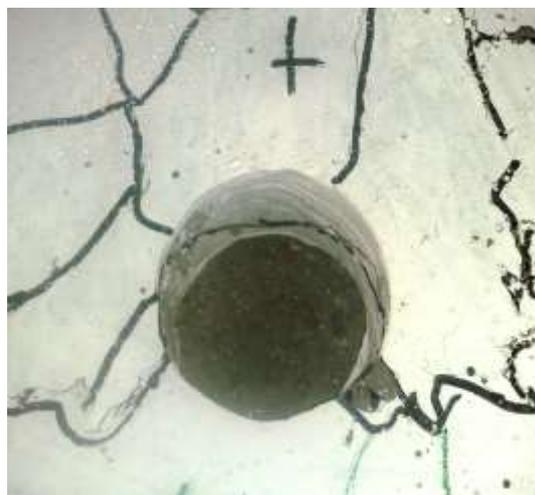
Crack Pattern at Failure for Specimen S7 within The Opening.
